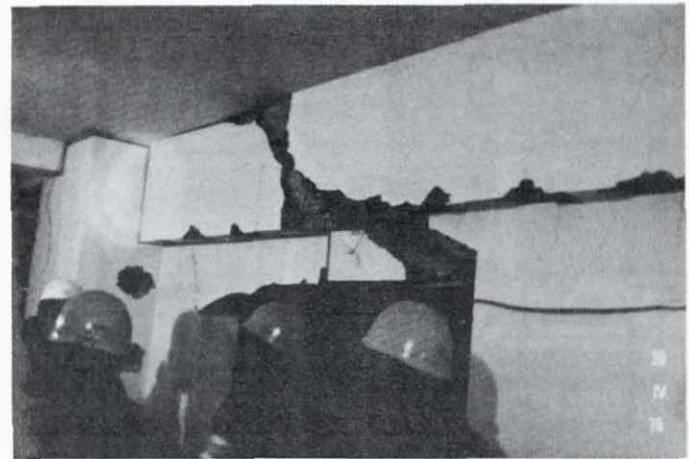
SHEARING CRACKS IN A GIRDER OF THE UNDERGROUND ROOM (HOTEL, 4-STORIES HIGH AND 2-STORIED BASEMENT, INATORI-REGION)
